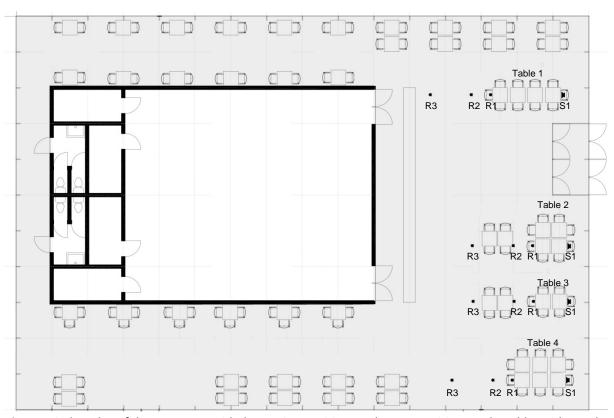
Floorplan of the restaurant with the receiver positions and source positions at the tables with panels
